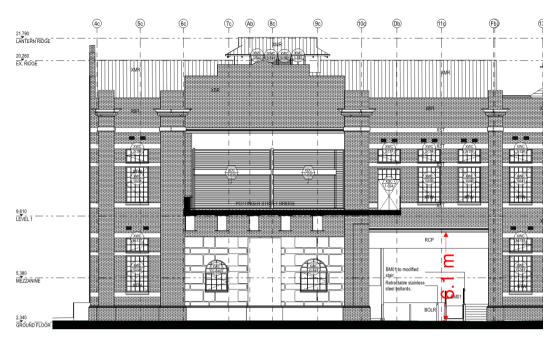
Location of collection point in Wharf 4/5 Breezeway 2. Drawing A-205 Shore sheds – Sth Elevation + Breezeway - Proposed. For coordination 21/2/2019
